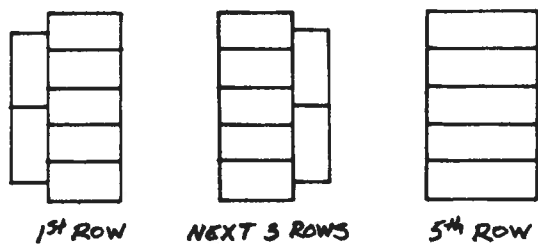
11: Method 3 for laying a 13 1/2" wall.
